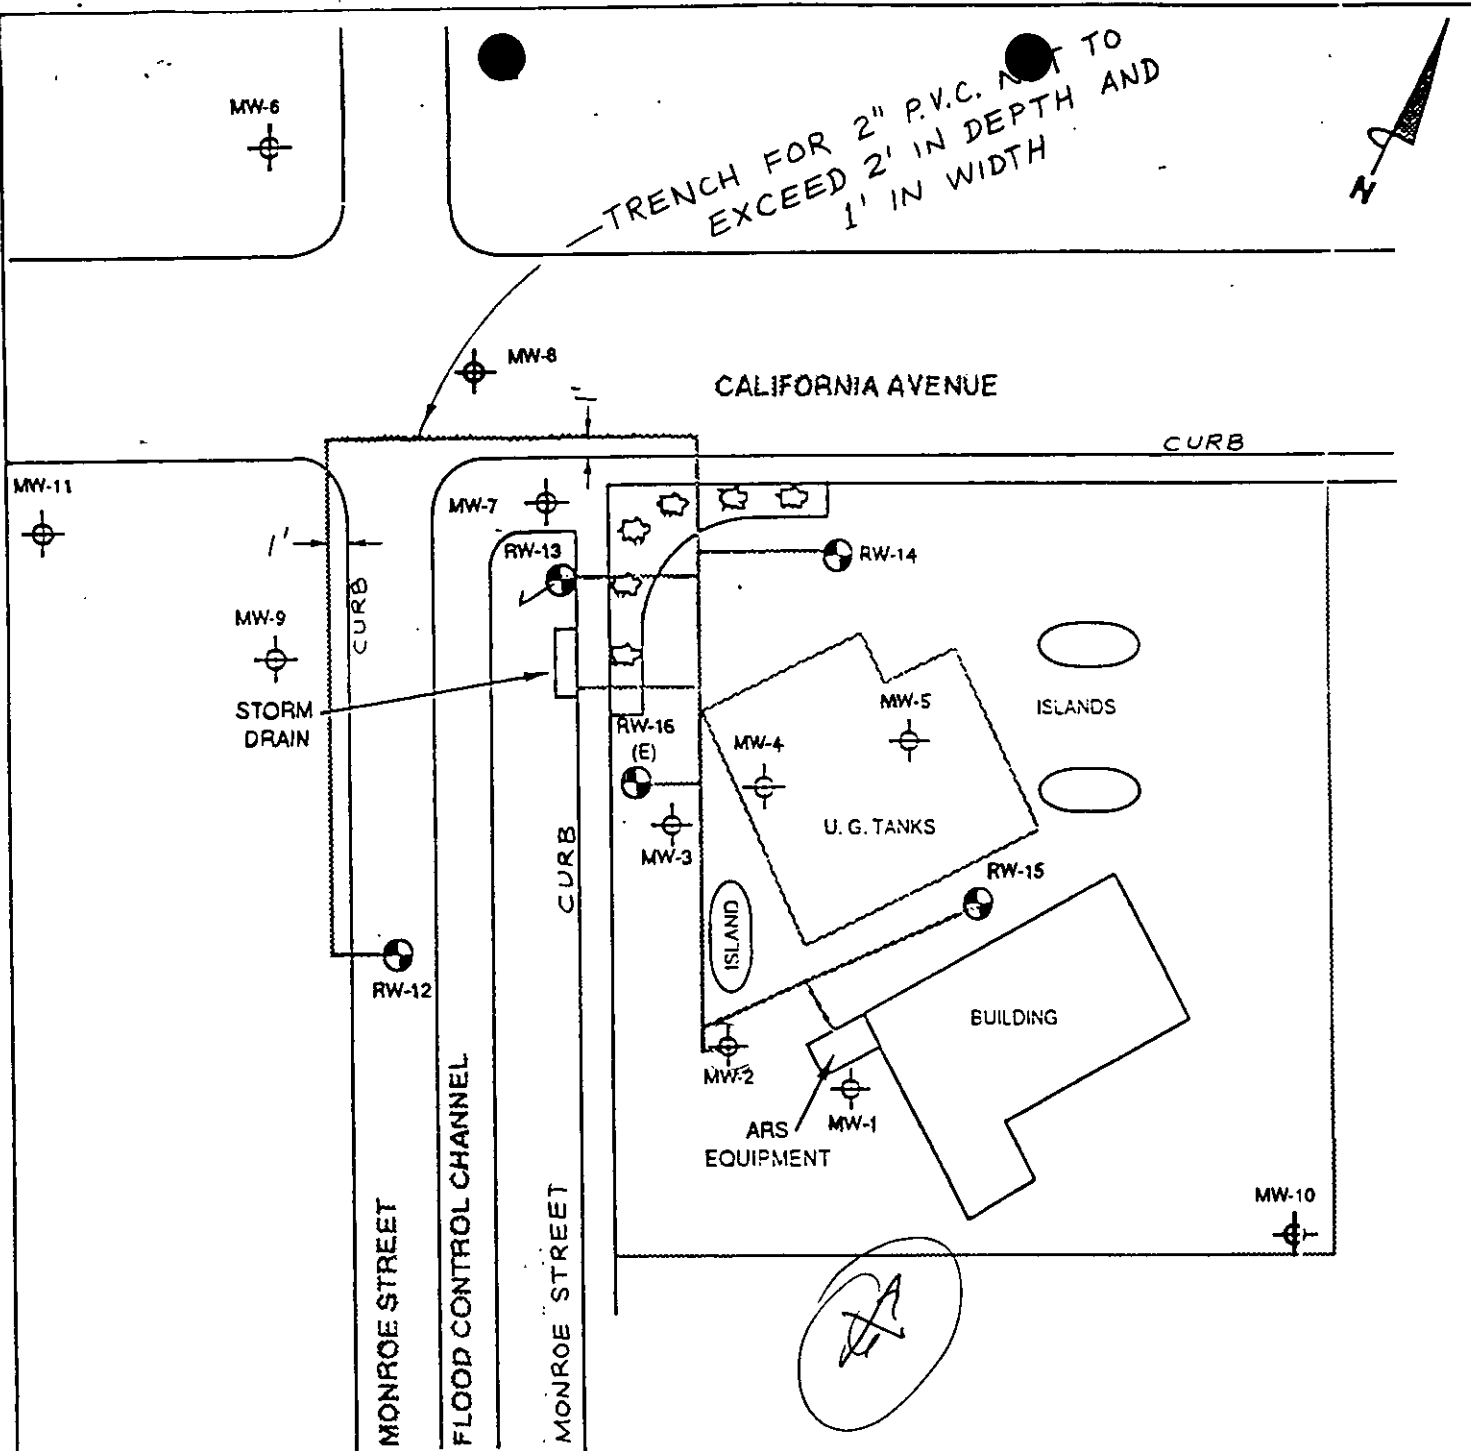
SITE PLAN SHOWING LOCATIONS OF GROUND WATER MONITORING WELLS AND PROPOSED ARS FACILITIES
